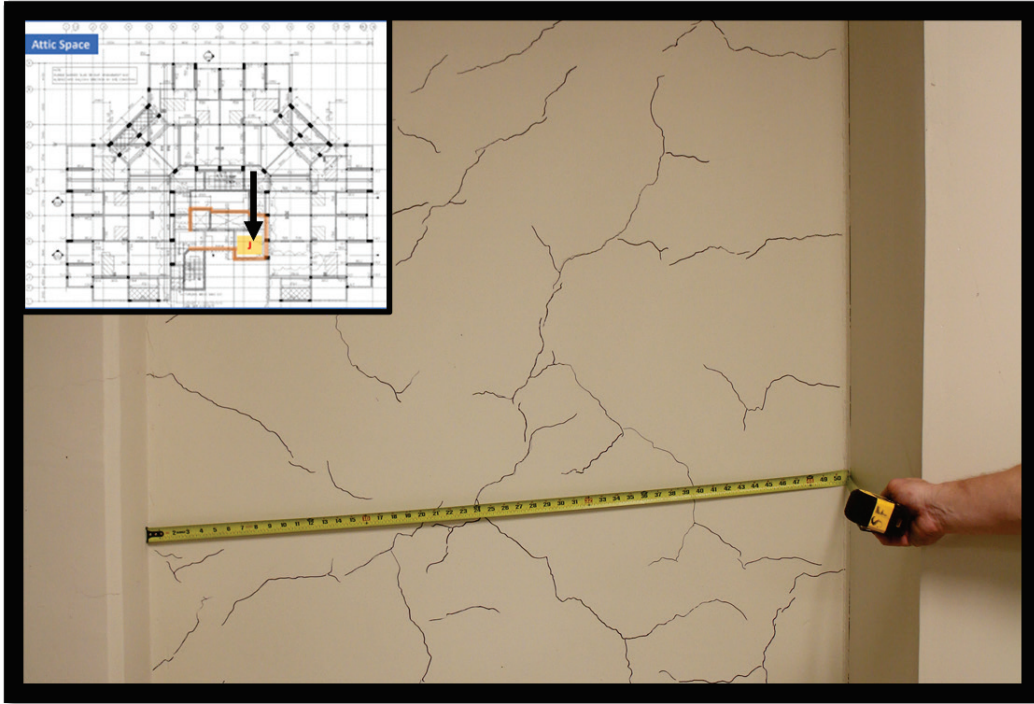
Cracking over mudded walls (typical) within the nonbasement floors of Tower 1 (Section I of the floorplan insert).
